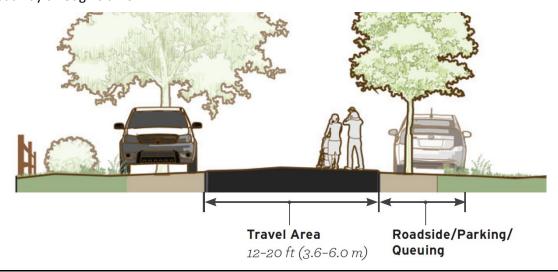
On Street Trail: Shared Roadway Source: FHWA Small Town and Rural Multimodal Networks
